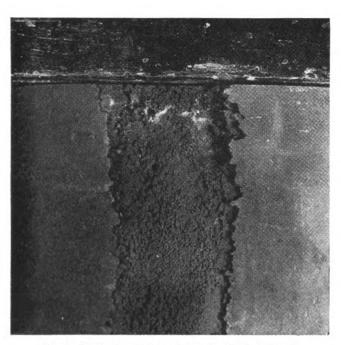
Detail of same type of corrosion shown in Fig. 3.
